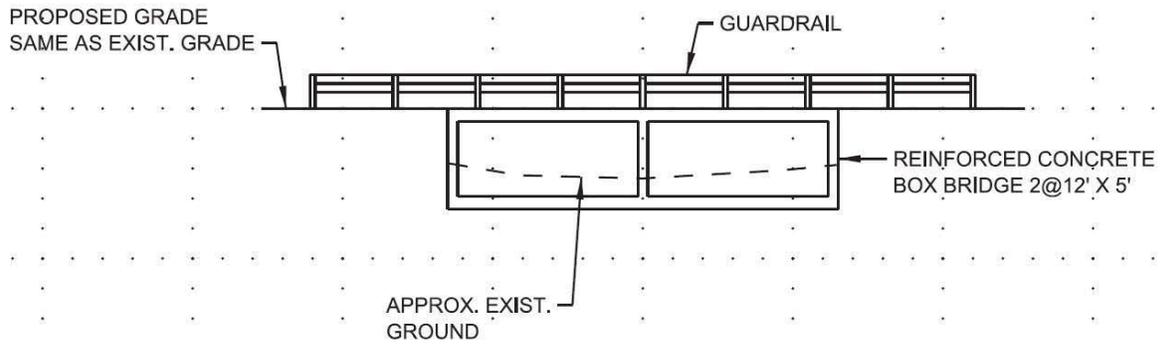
Shows profile of the replacement bridge according to TIR dated 04/12/2018.
